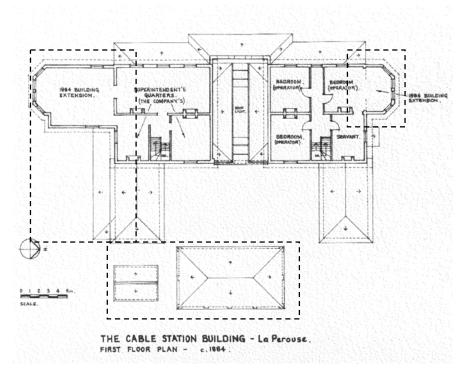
First floor plan of Cable Station building following early additions (from Danis et al.: 165).
